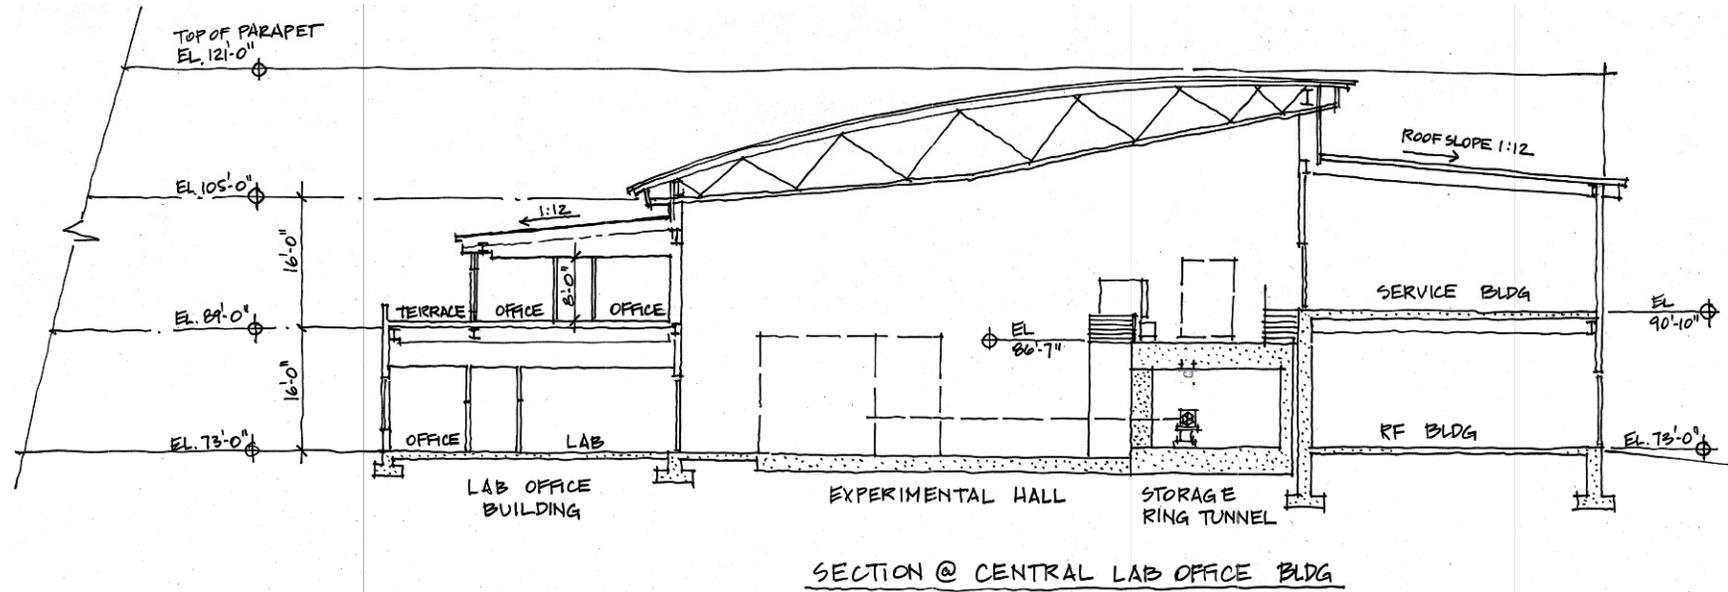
Cross-section of Ring Building through center of CLOB and MER.
